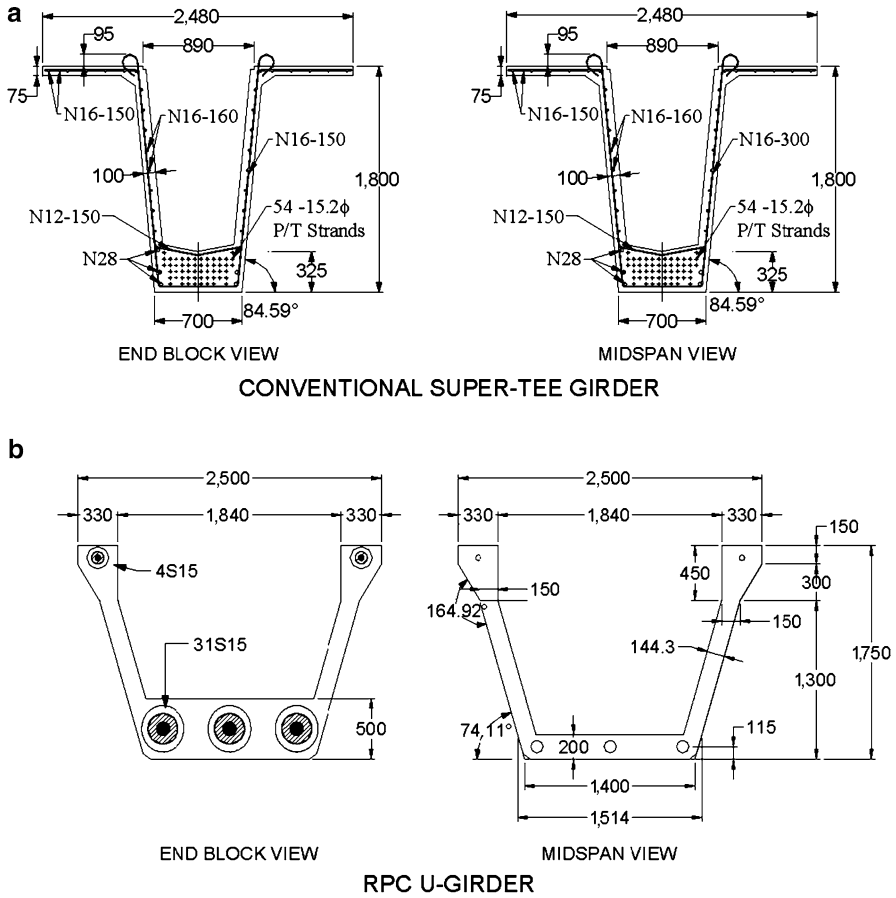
Dimension of (a) conventional Super-T girders design and (b) RPC U-girder bridge
